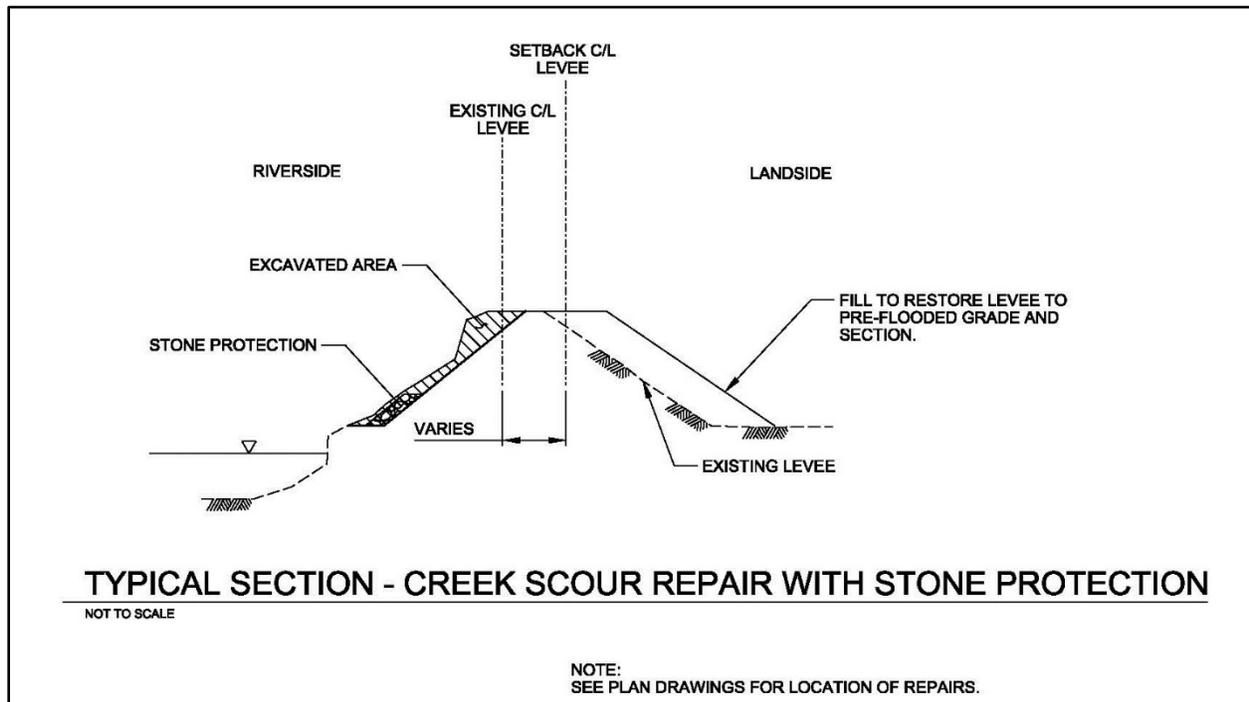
Diagram of typical cross-section of creek scour repair with stone protection.
